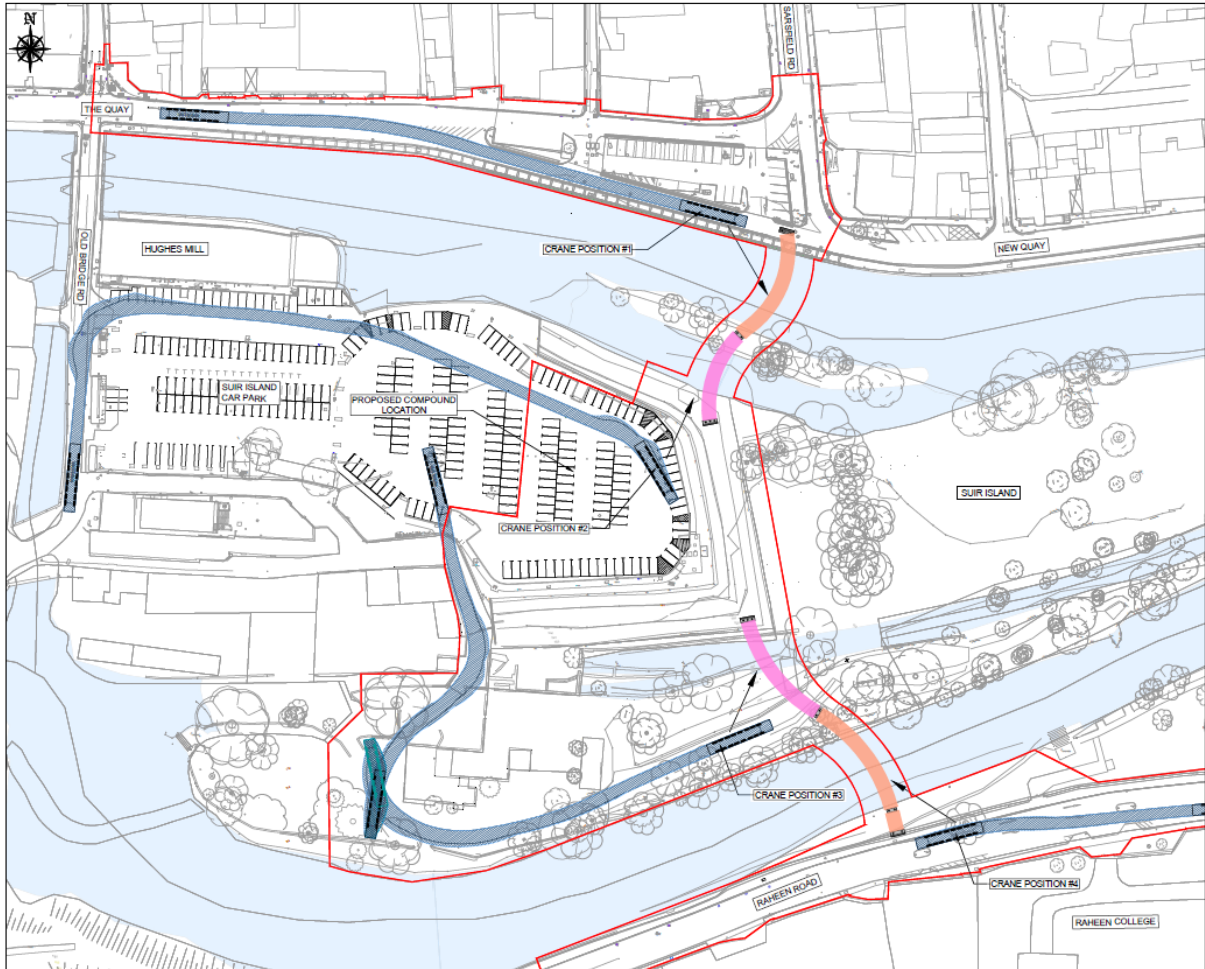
The proposed development areas as detail drawing area showing Northern and Southern bridges, with Links to the existing flood barrier berm with proposed pier locations. Pier locations shall entail tree removals.
